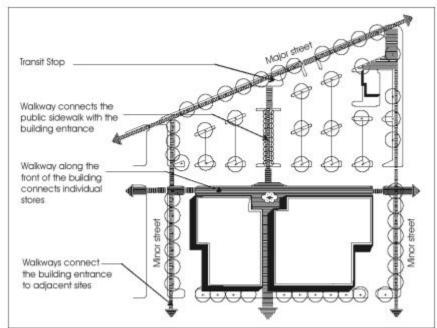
(D): In this commercial site, landscaped walkways provide pedestrian connections. These walkways provide a safe, accessible pedestrian route from the street to the building entry and to neighboring properties.
